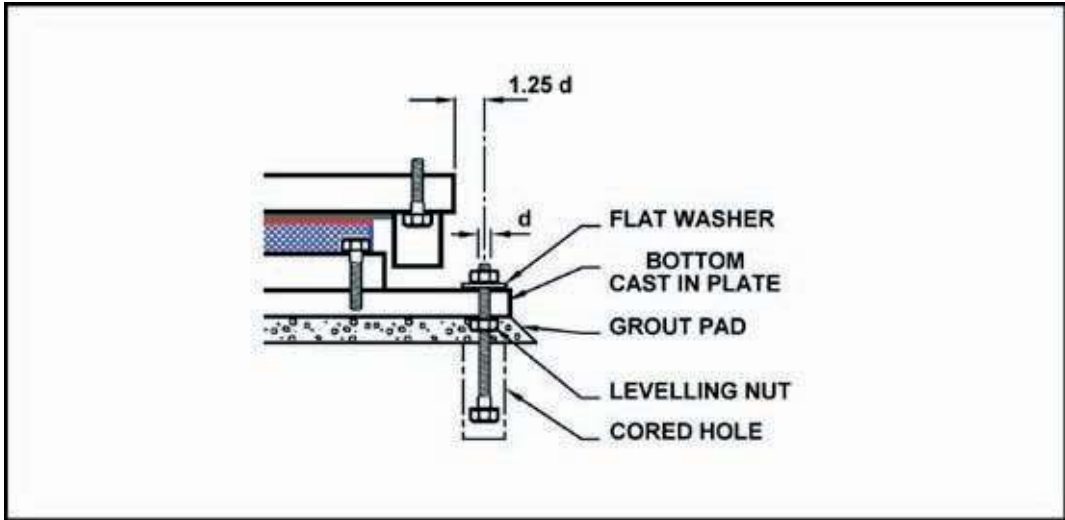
Alternate Bottom Cast-in Bolt Detail
